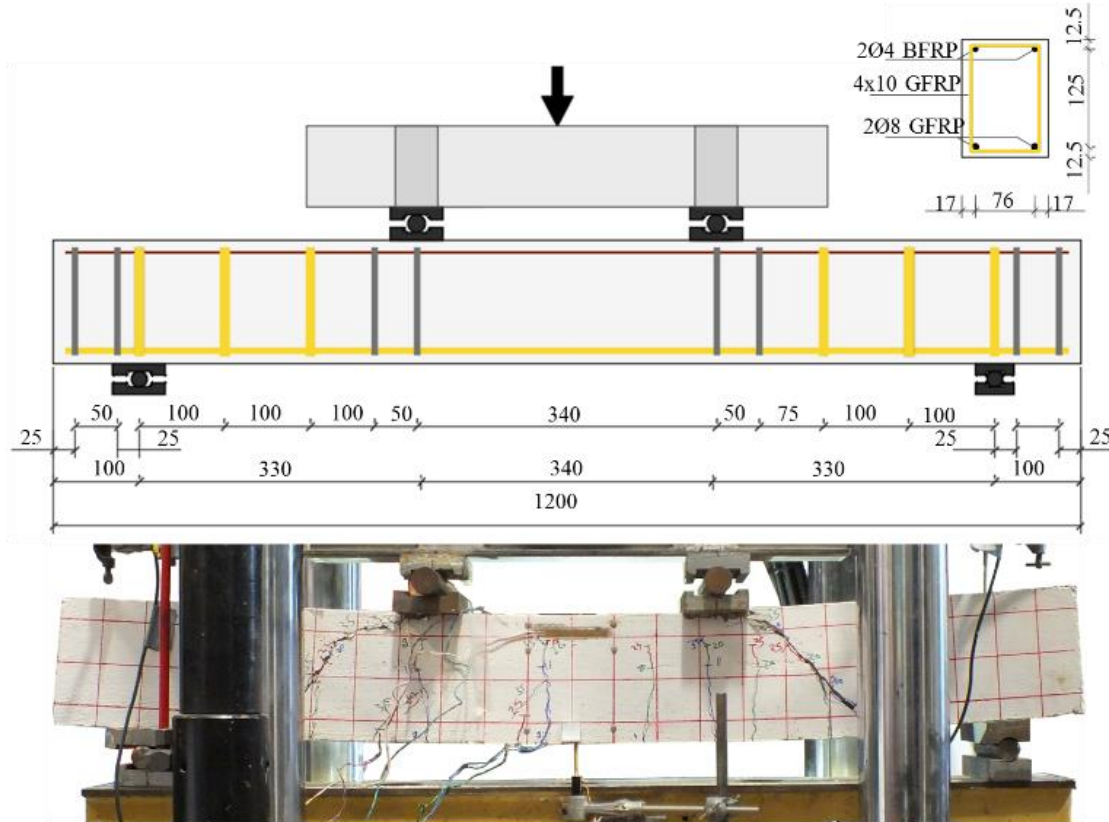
2: Geometric details and test set-up of the tested FRP RC beams (all dimensions in mm)
